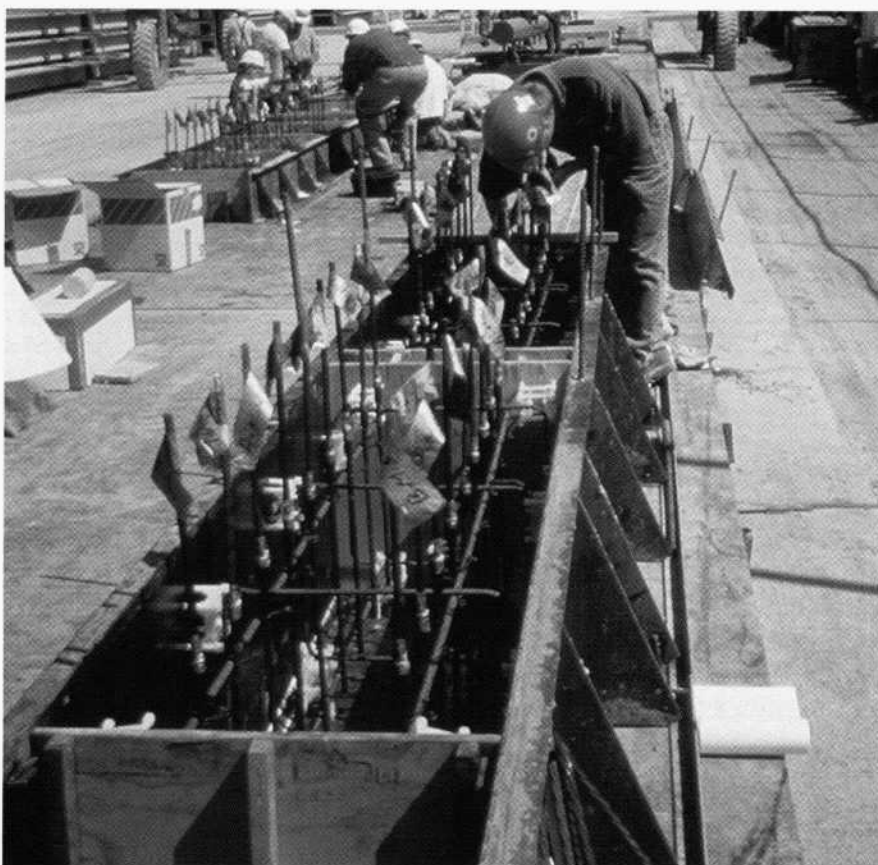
Strand specimens in place, ready for casting pull-out test blocks (May 17, 1996).
